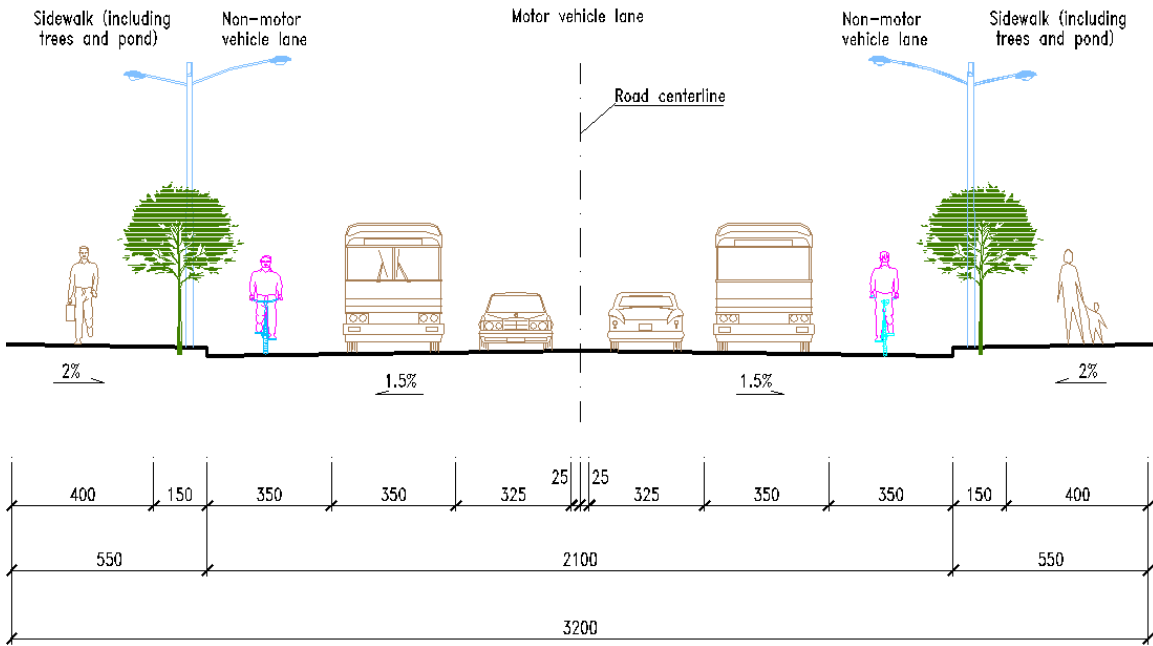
Standard section of Horizontal Road No. 8
